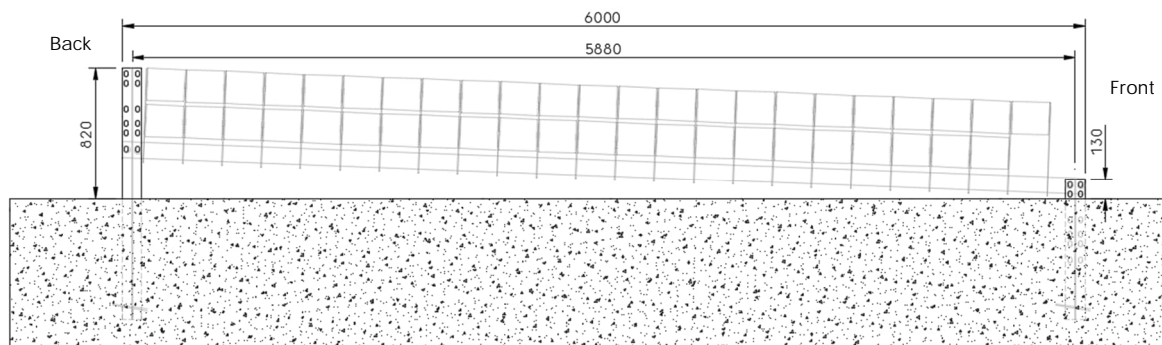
The completed installation of the pre-assembled terminal with I120 posts
